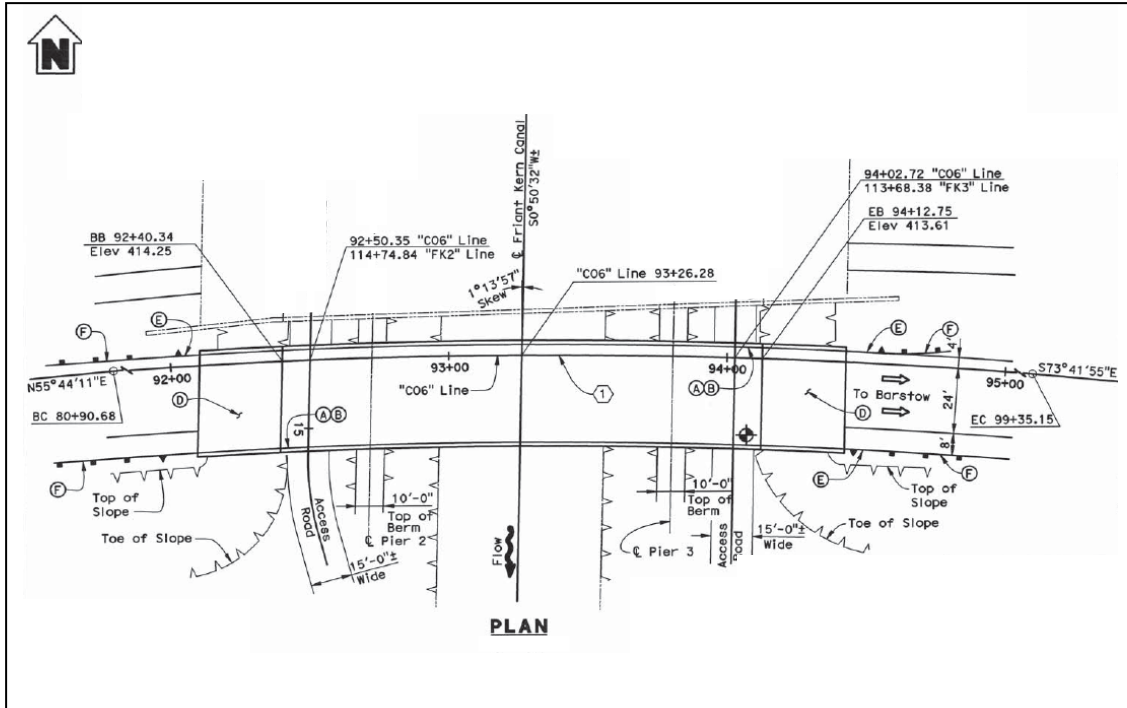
Plan of Proposed Bridge over Friant-Kern Canal
